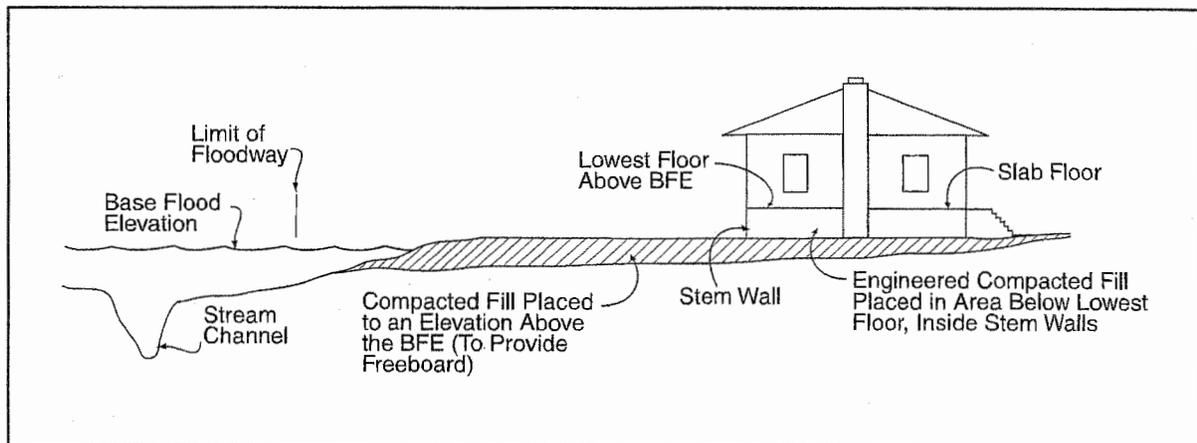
Structure on a stem wall foundation. The lowest floor is raised above the BFE. The space enclosed by the stem walls is filled with engineered compacted fill.
